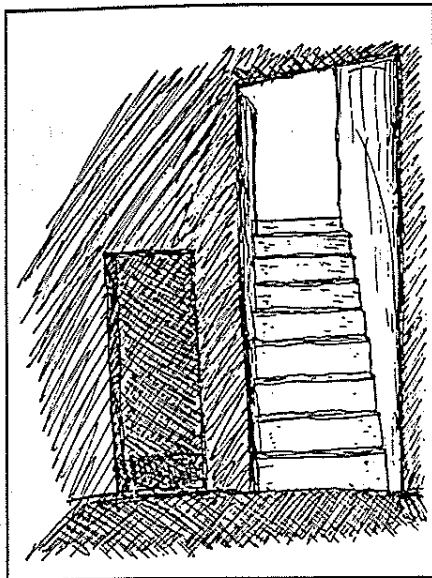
Stairs built with stones joined with earth mortar. Some stairs are reinforced with cement.
